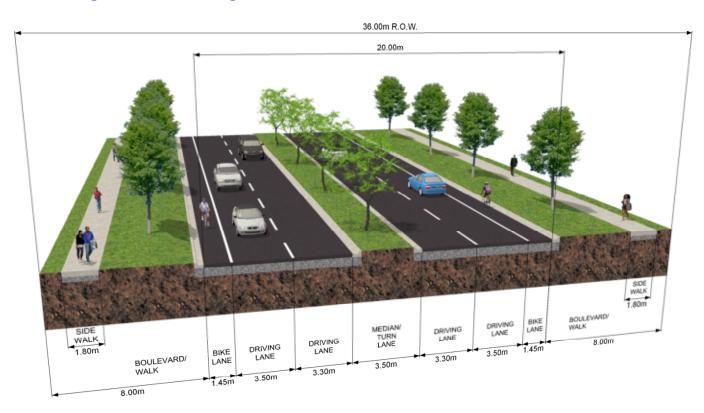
Potential Urban Cross Section Retrofit
